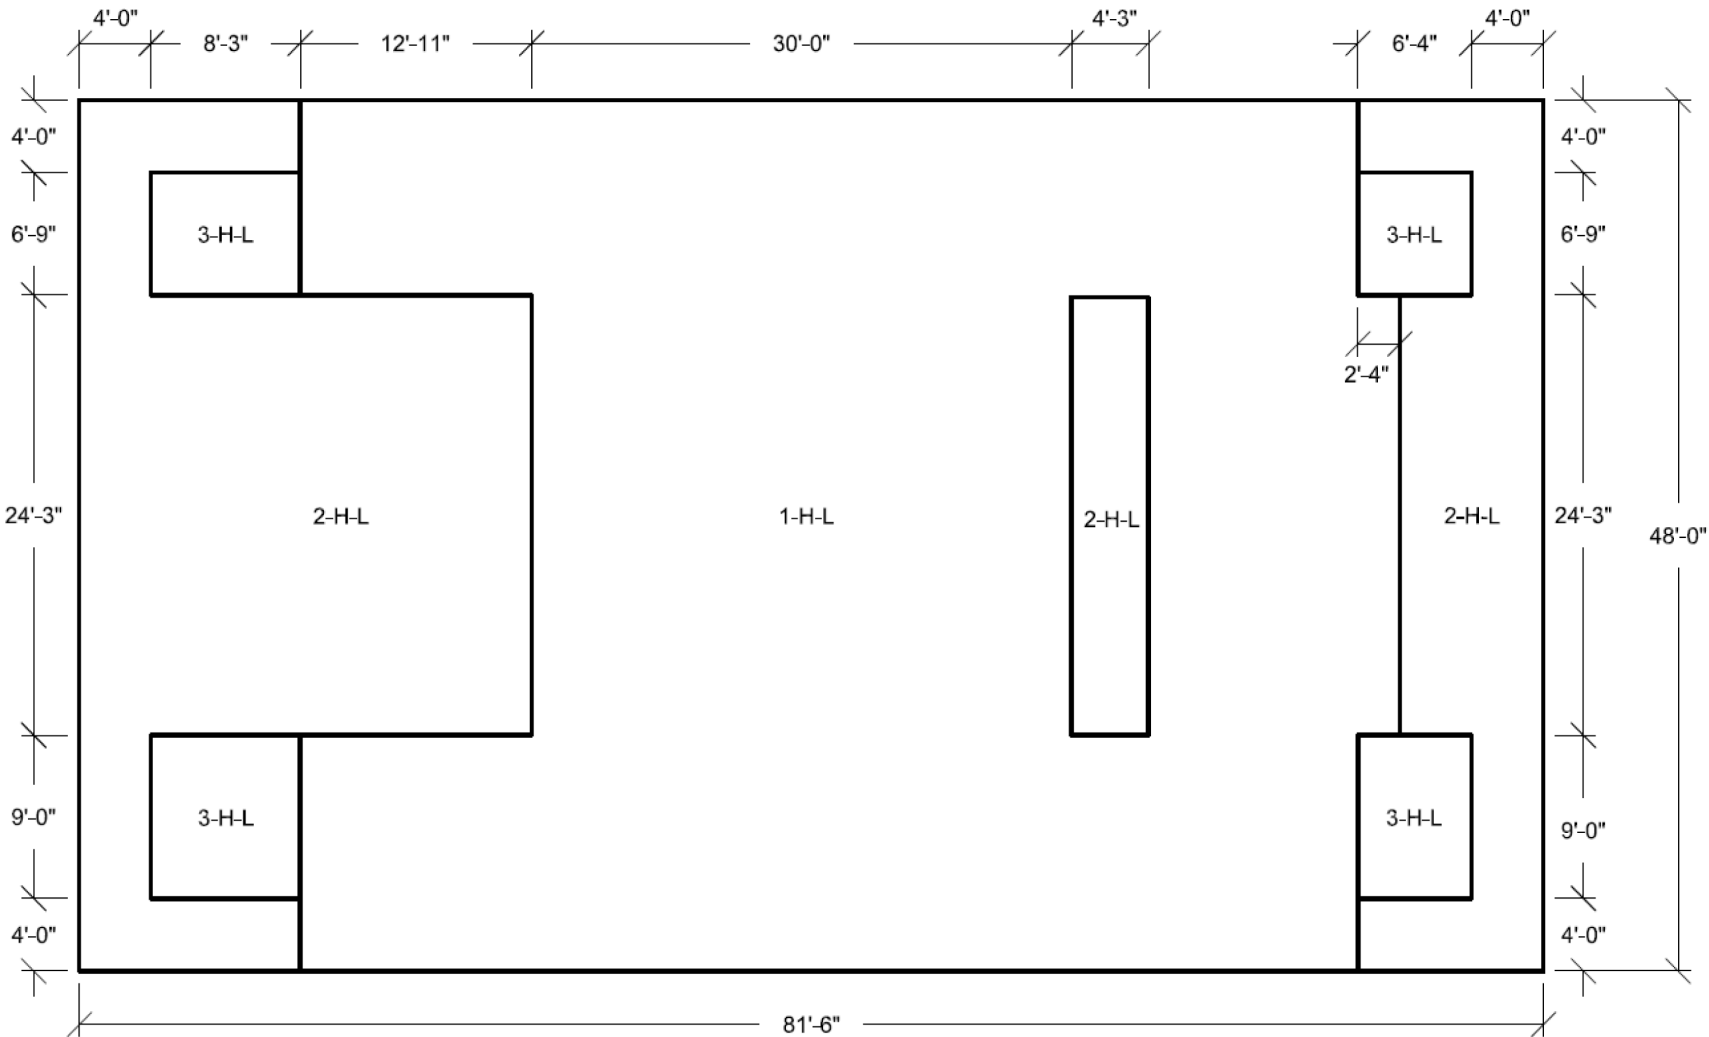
H.6-142 DGFOV Slab 1 Looking Down
